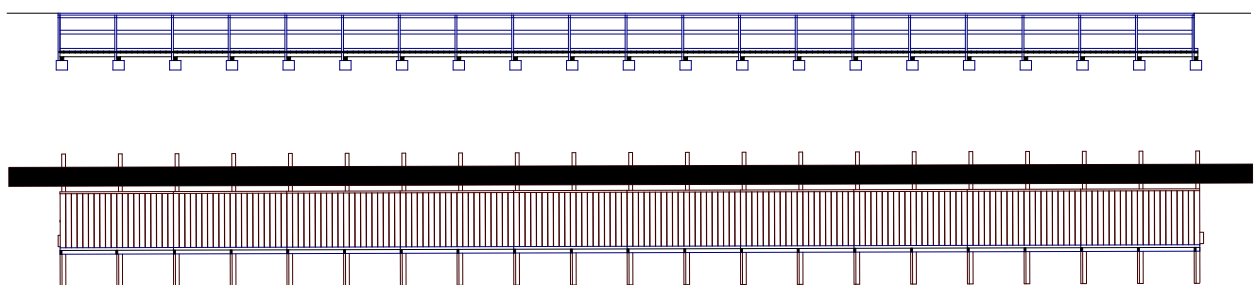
Footbridge plan and elevation 1:200 (A4)
